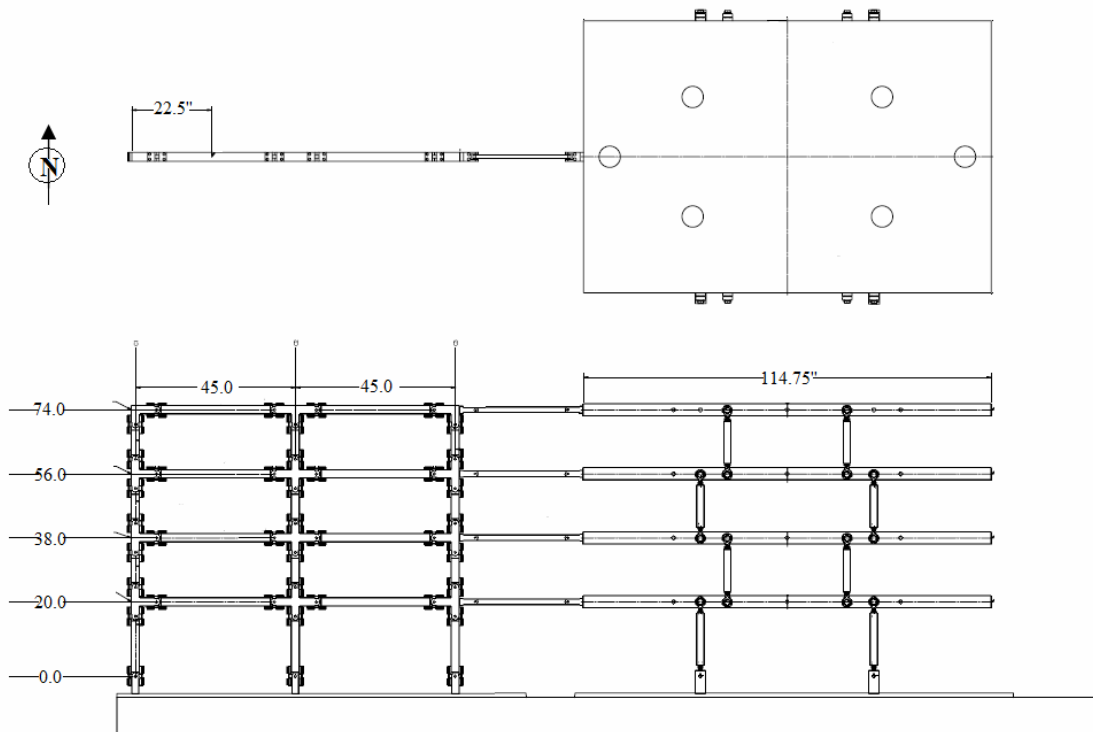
Plan view and elevation of the test frame and mass simulator
